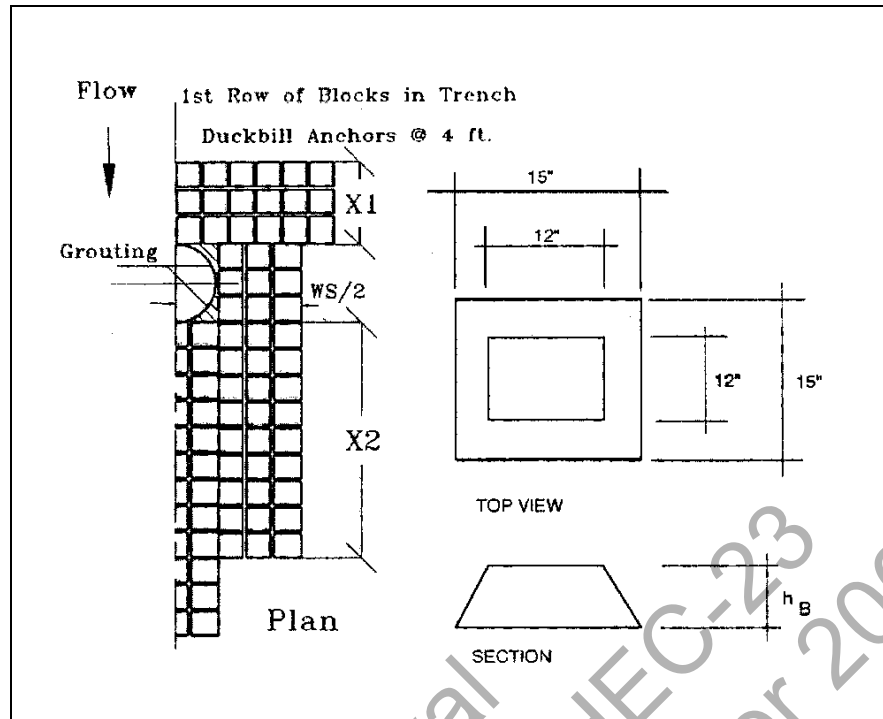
Suggested cable-tied mat dimensions for scour protection around circular bridge piers (after McCorquodale).⁽⁹⁾
